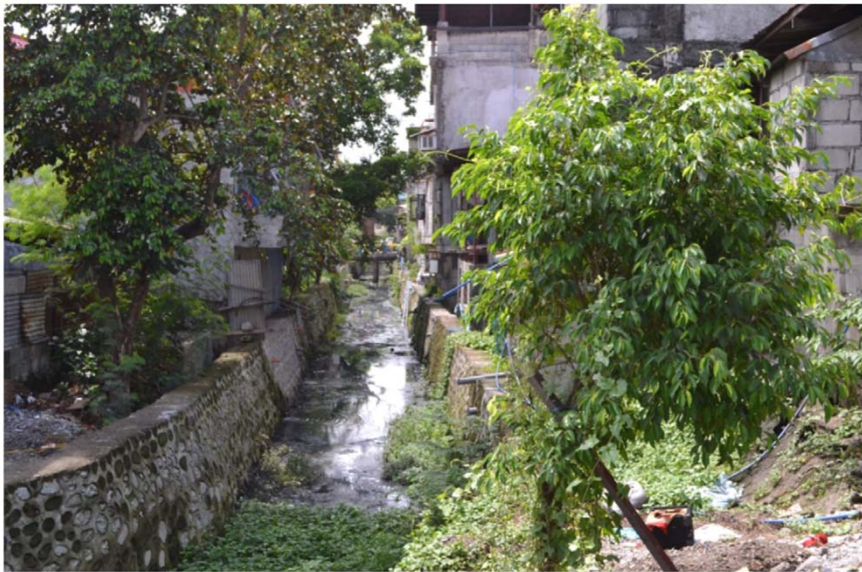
## PHOTOS OF PROJECT SITE PRIOR TO CONSTRUCTION
